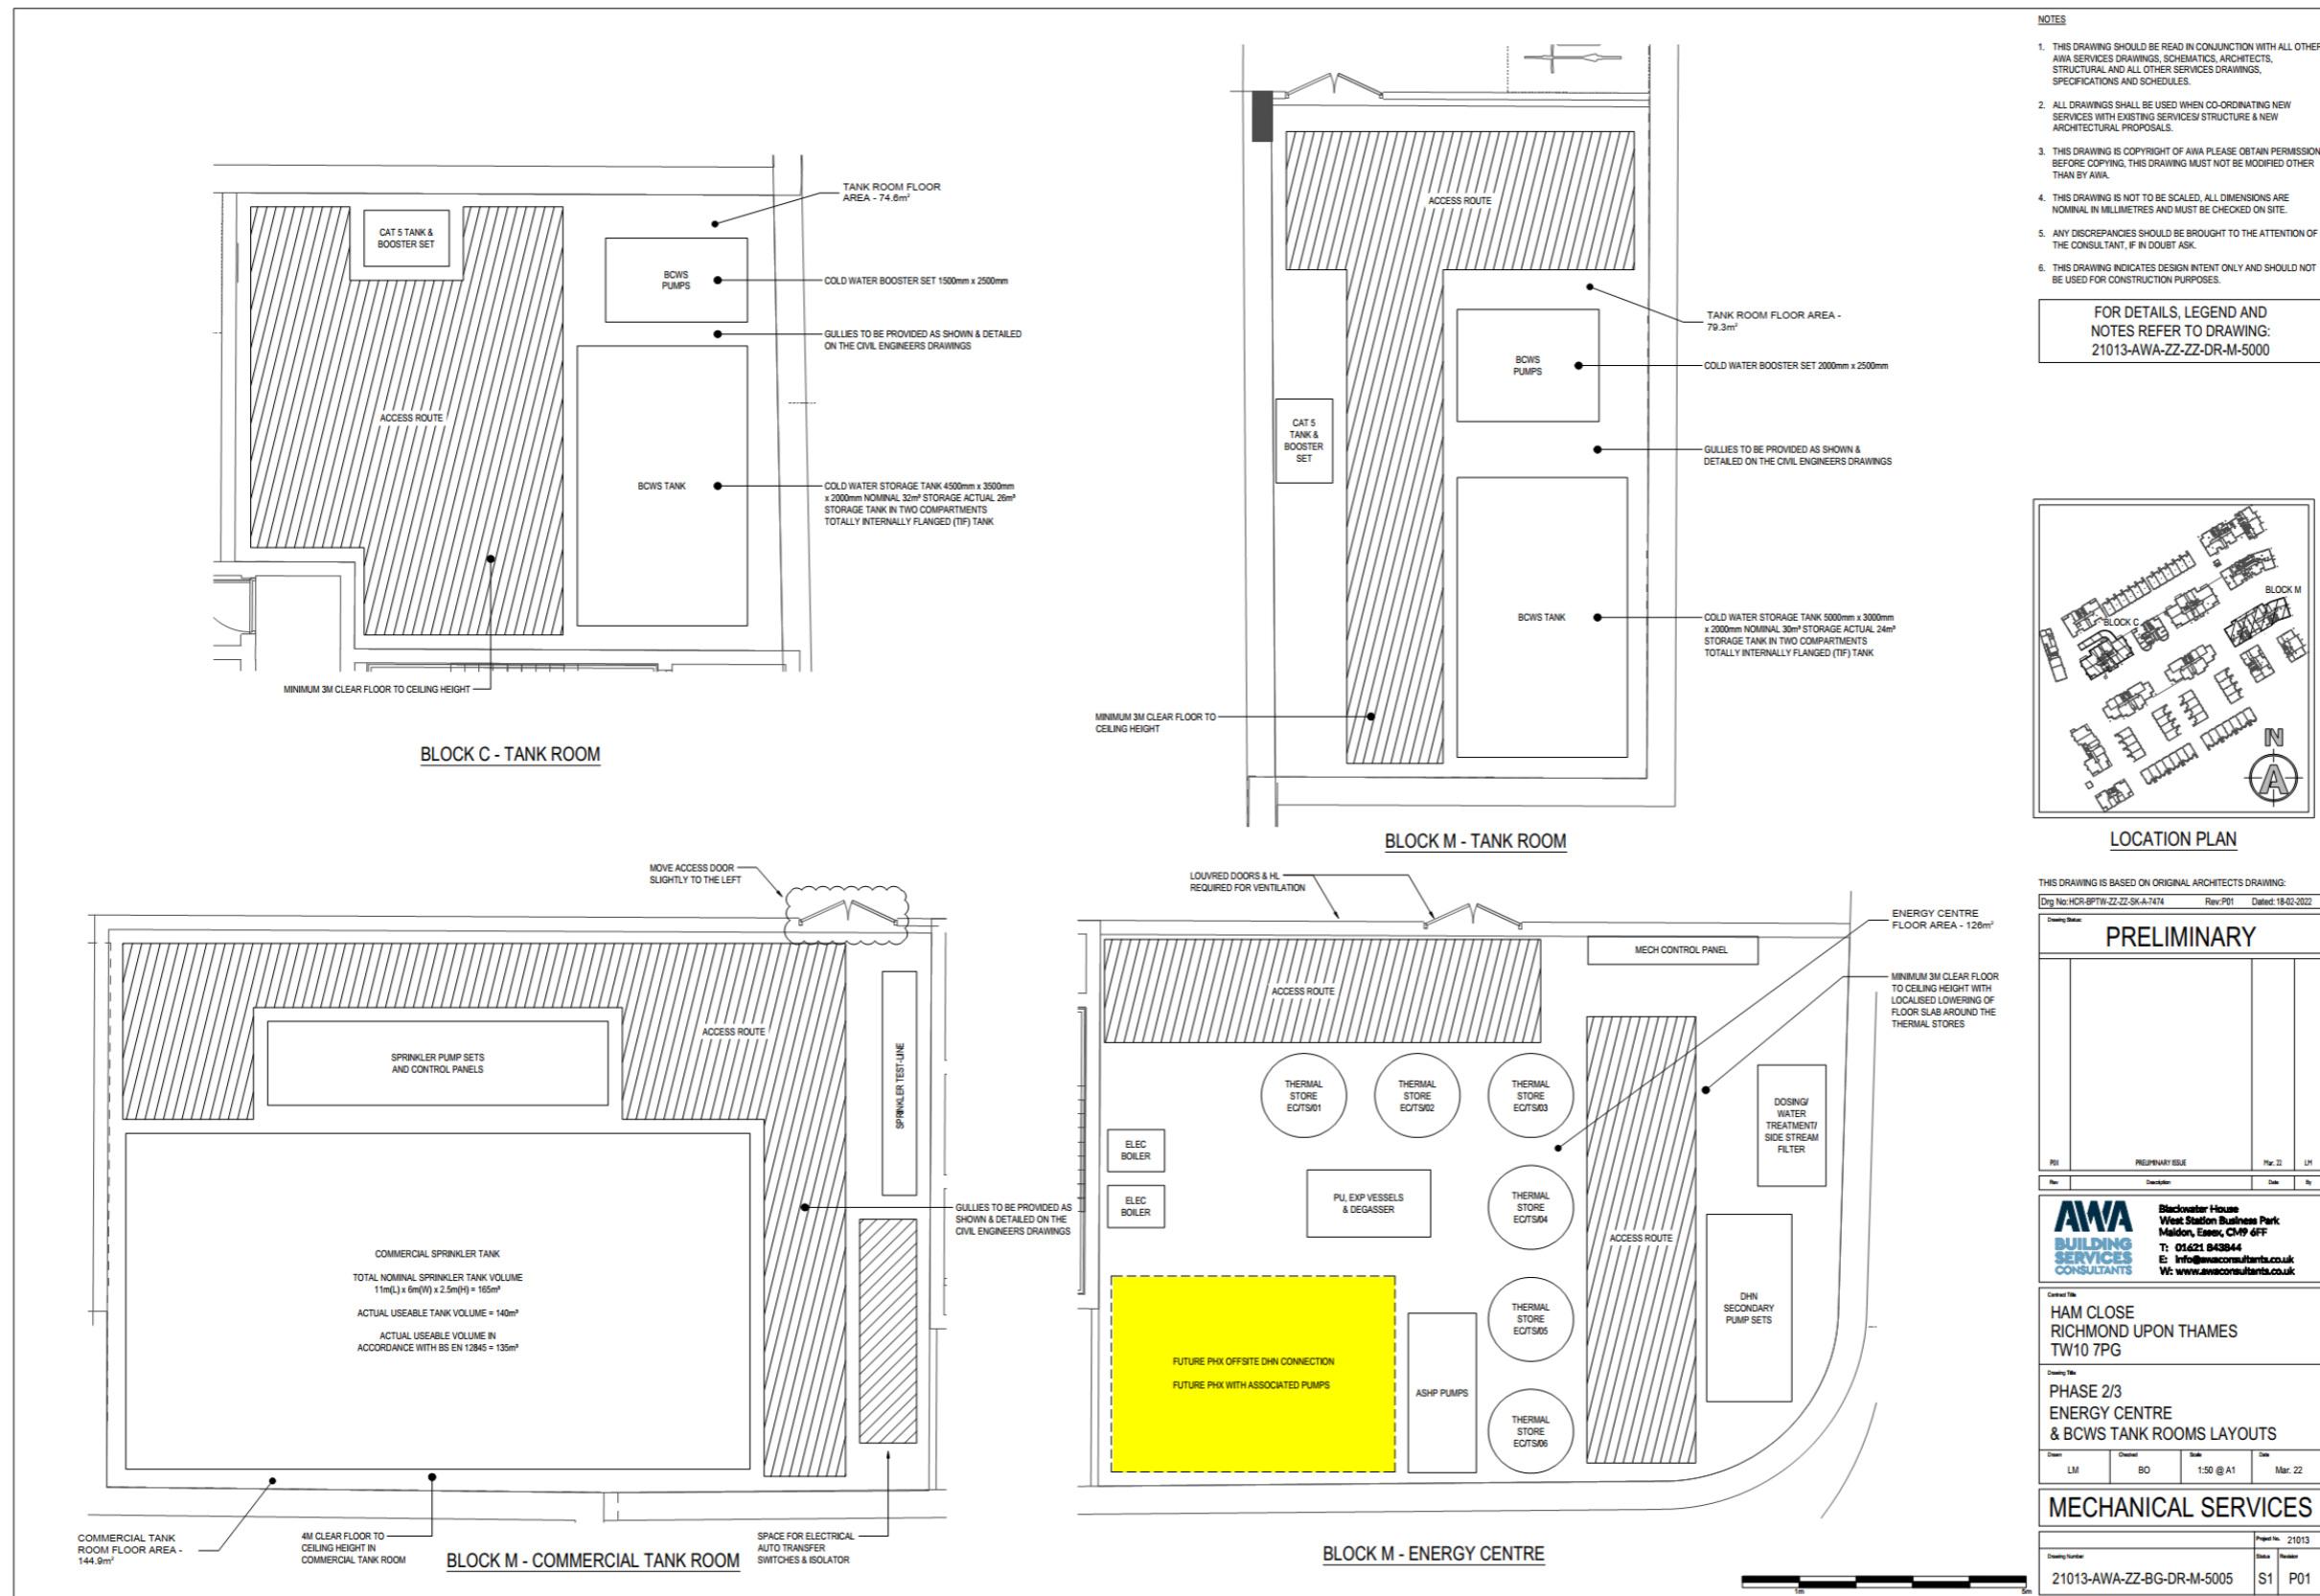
Phase 2/3 Energy Centre, proposed plant room layout indicating future DHN connection space provision (AWA drawing 21013-AWA-BB-00-DR-M-5006)
